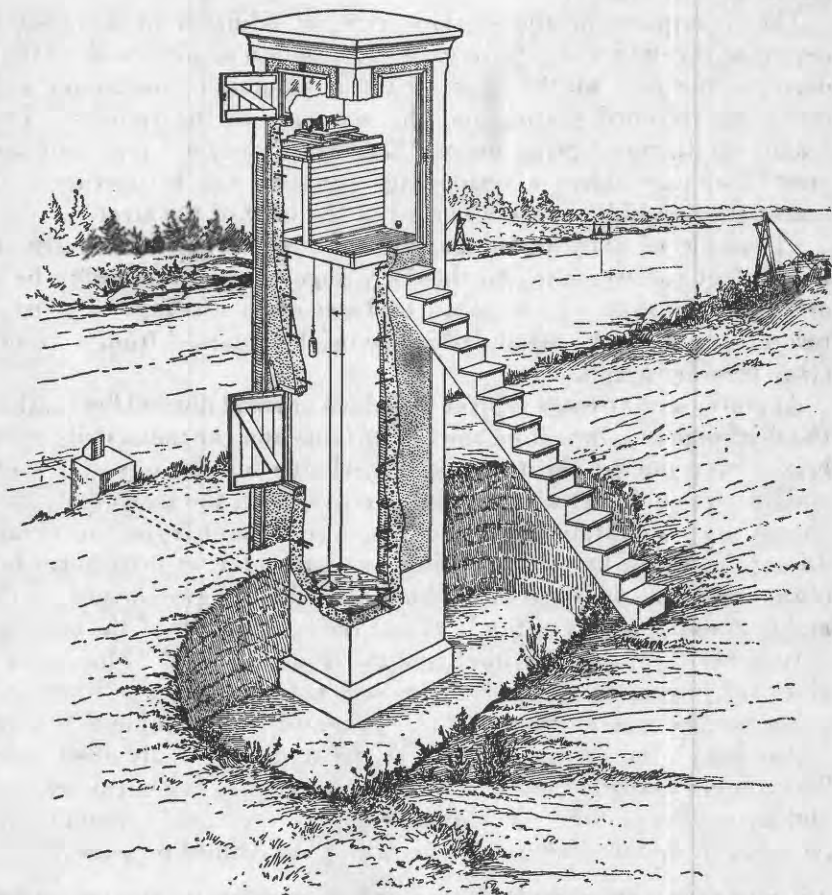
Typical river measurement station showing concrete well and house for water-stage recorder and staff gages, cable, and car
